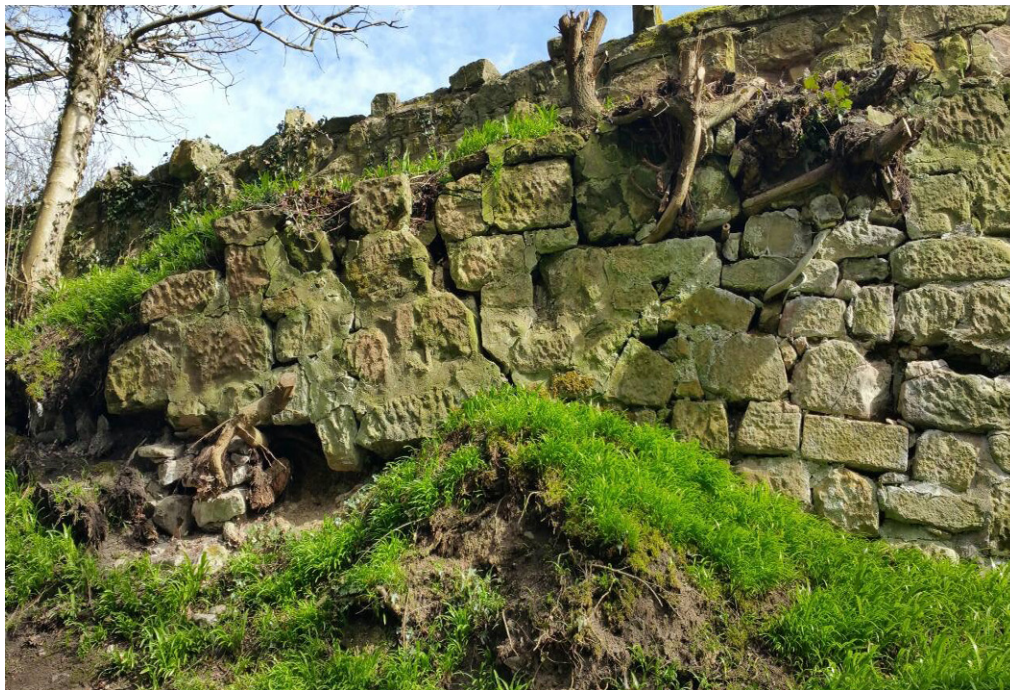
View of the retaining wall from the west prior to the scaffolding being erected
